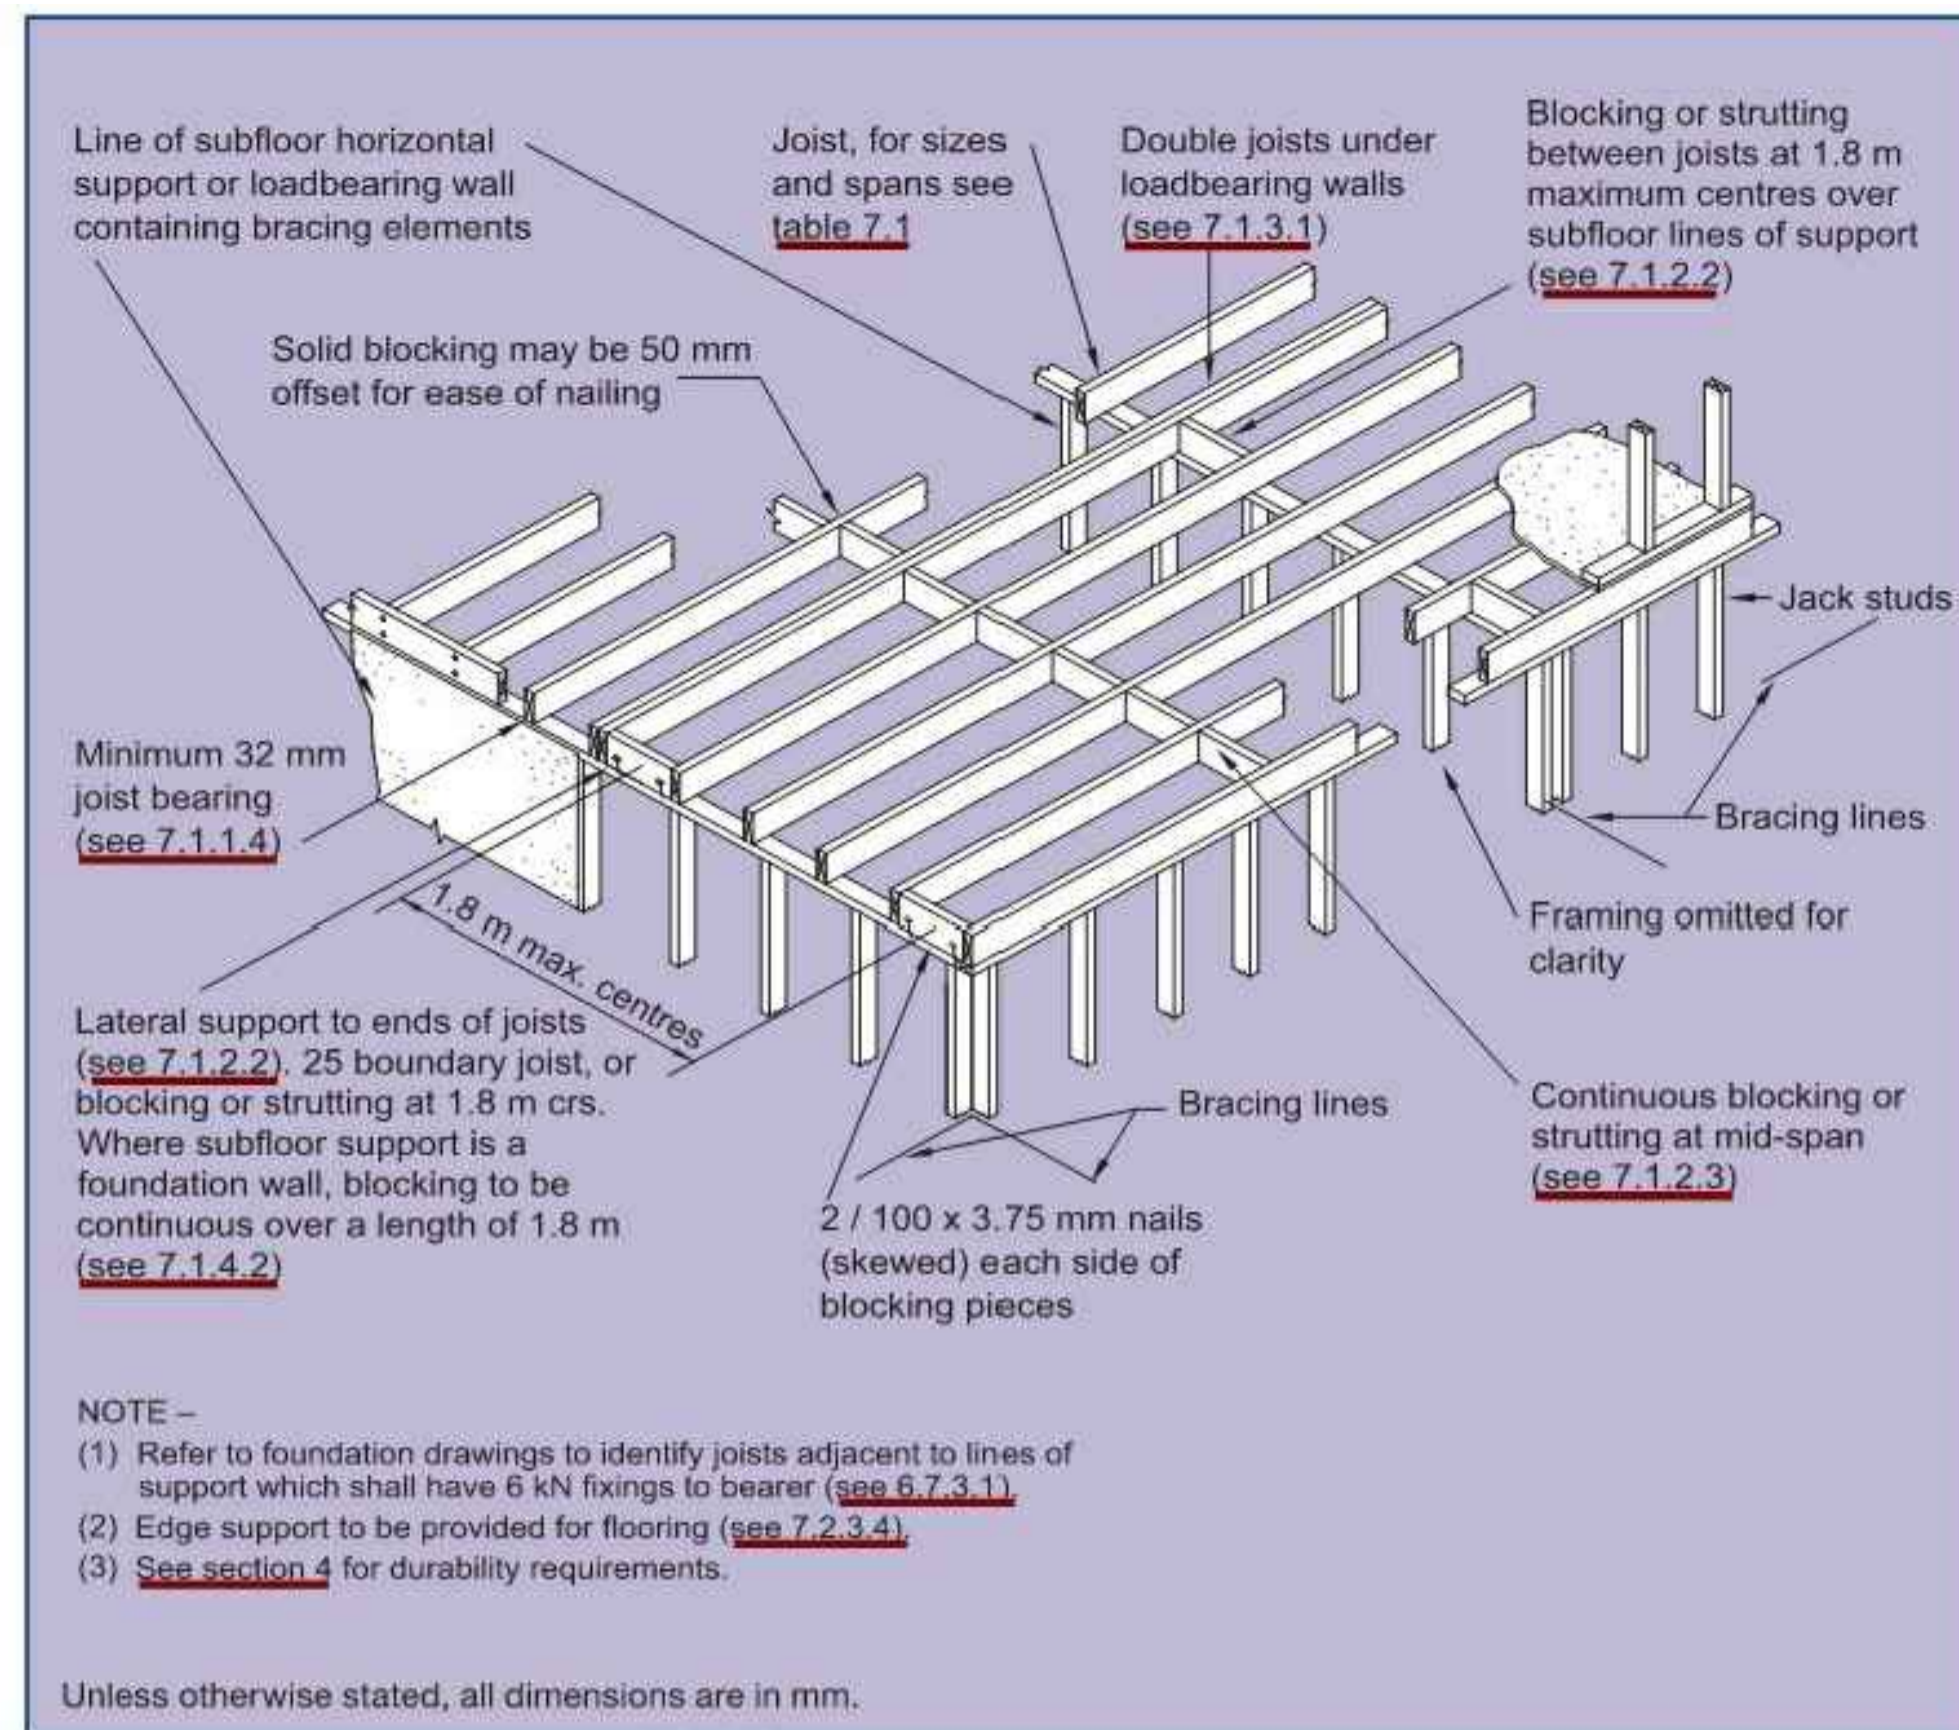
Floor joists layout criteria (see 7.1.2.2)
